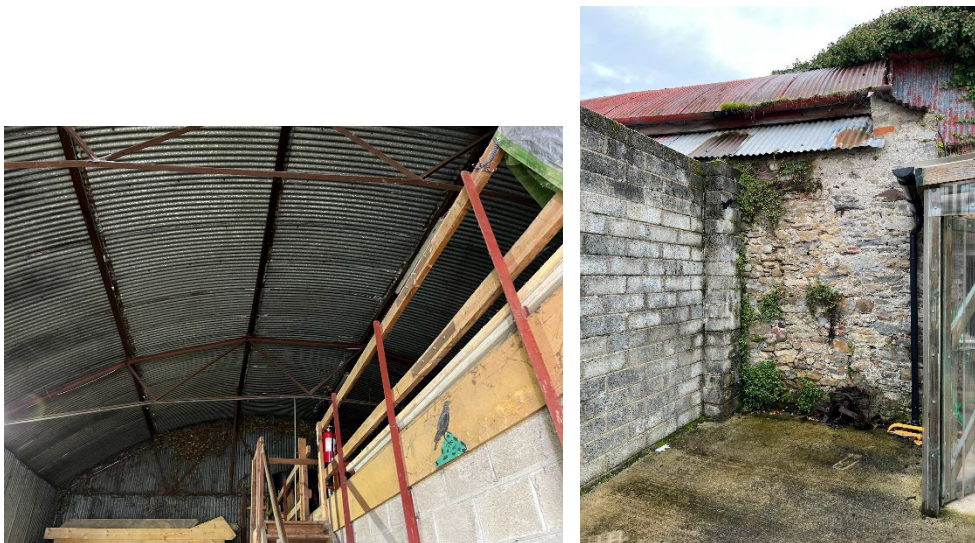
Roof of main shed, left, and detail of external south-western corner of shed (right)
